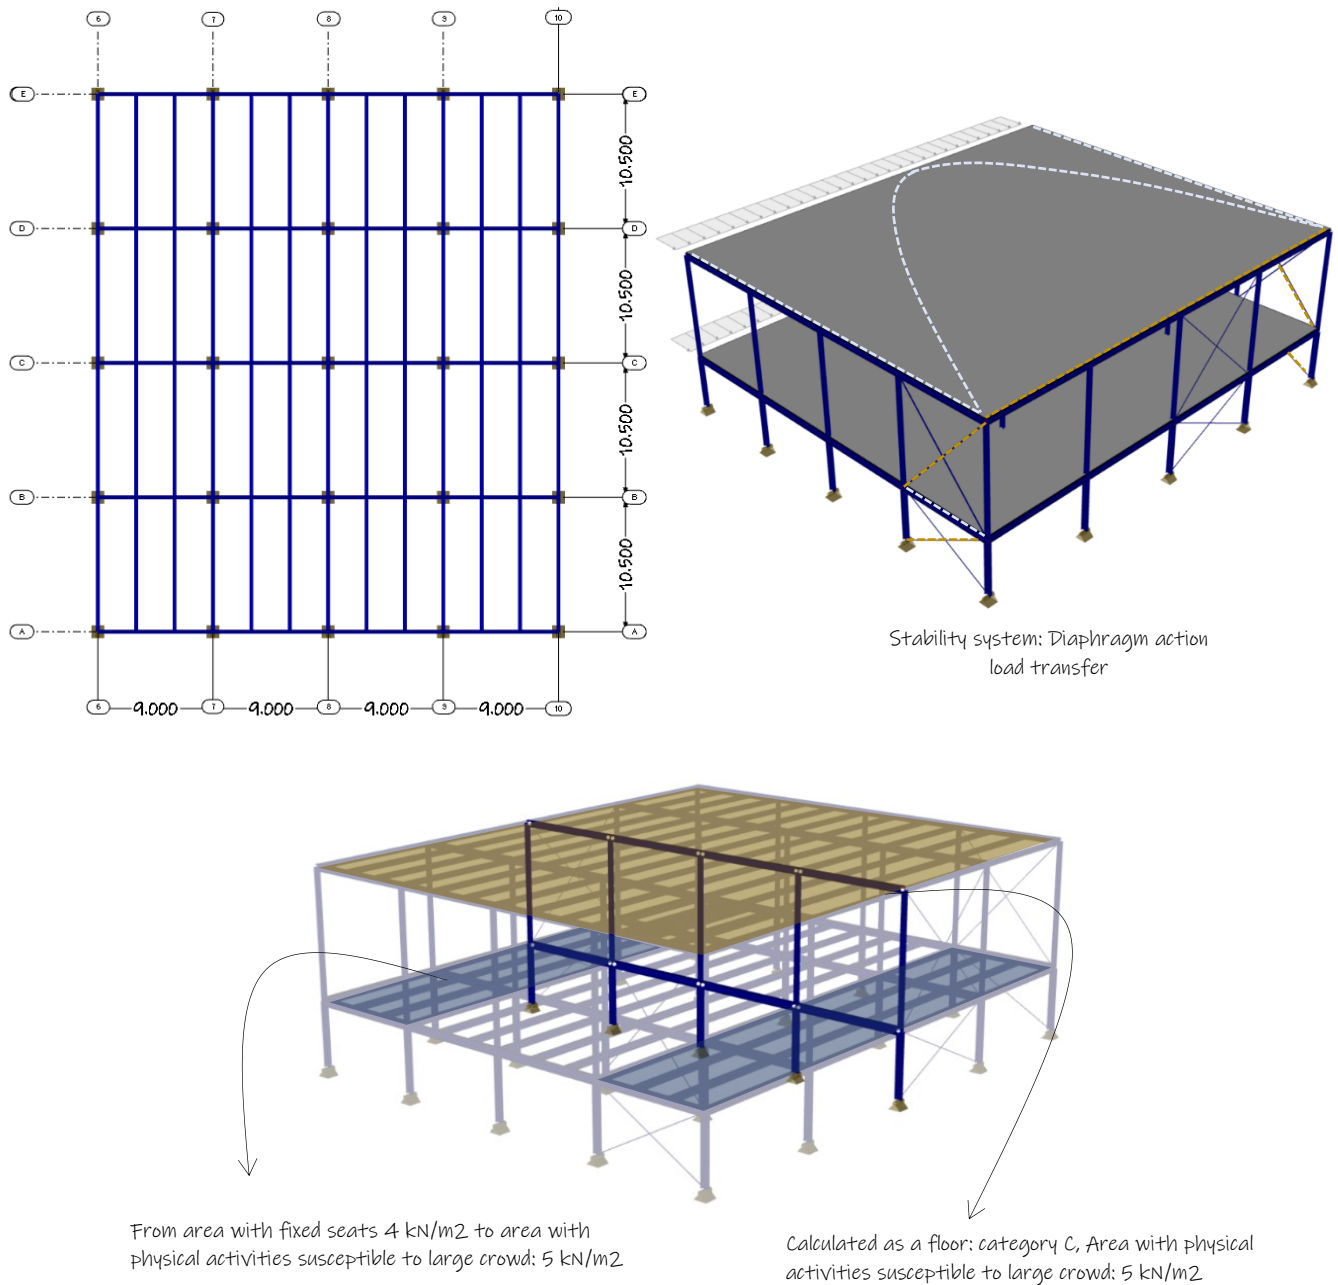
Convertible Scalable design conceptual structural overview: floor plan, and stability system and structural consideration on surplus capacity.
